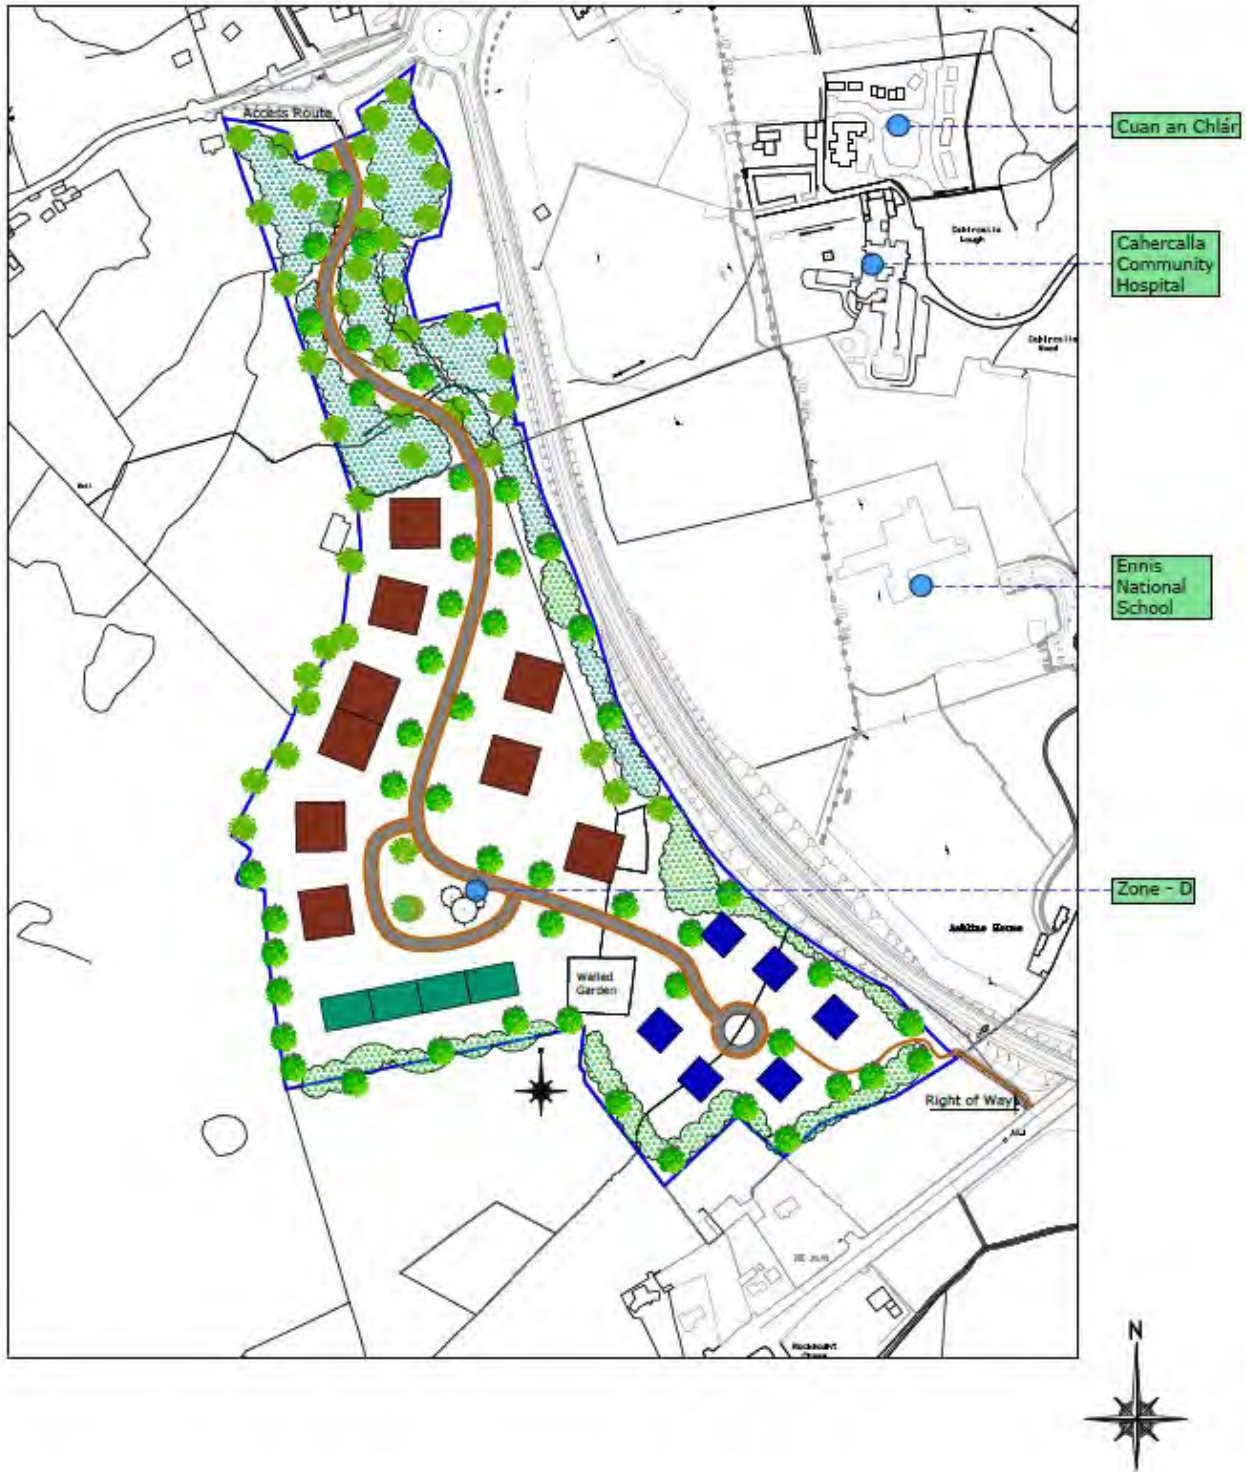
Proposed Enterprise Campus Layout at Beechpark
